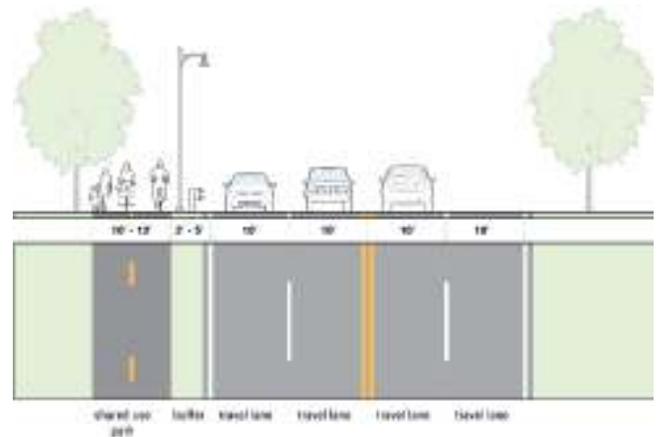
Hammond Pond Parkway Segment 3 Long-term with Four Lane Cross Section
